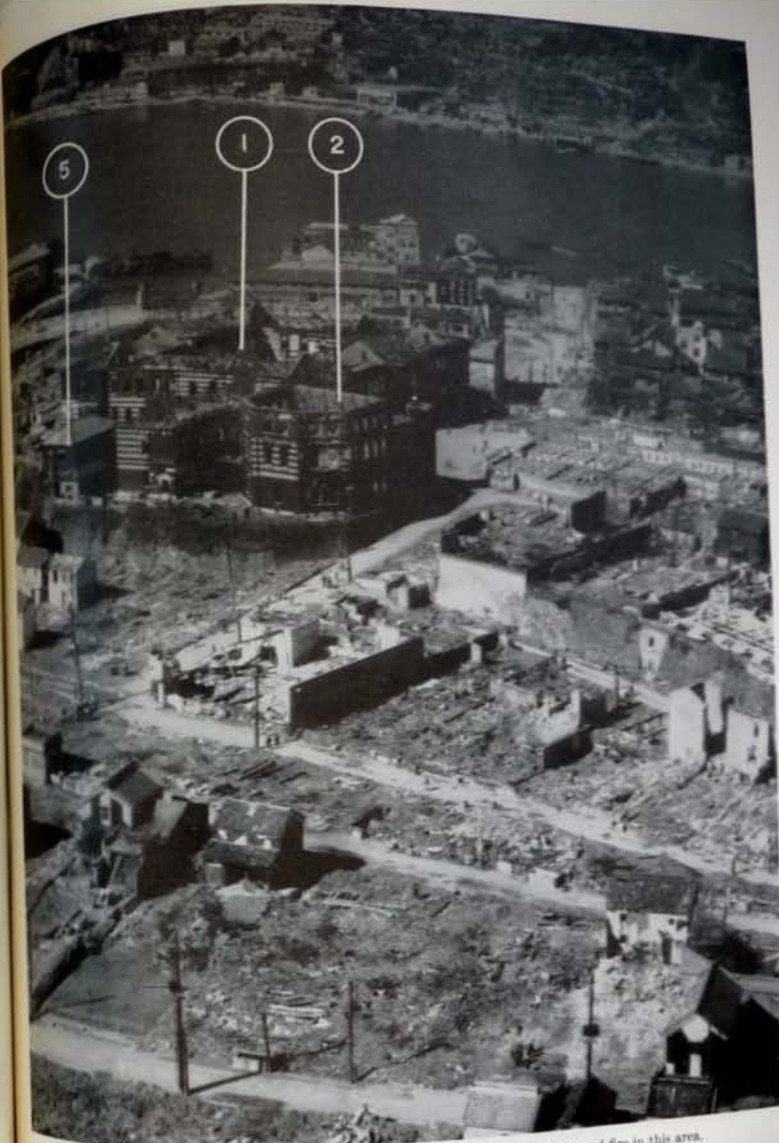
10,900 feet from GZ. Group 81, destruction by blast and fire in this area.
